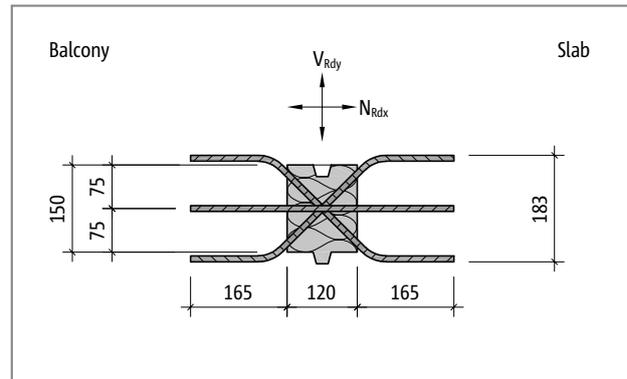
Schöck Isokorb® XT type H-VV1-NN1: Product plan view
